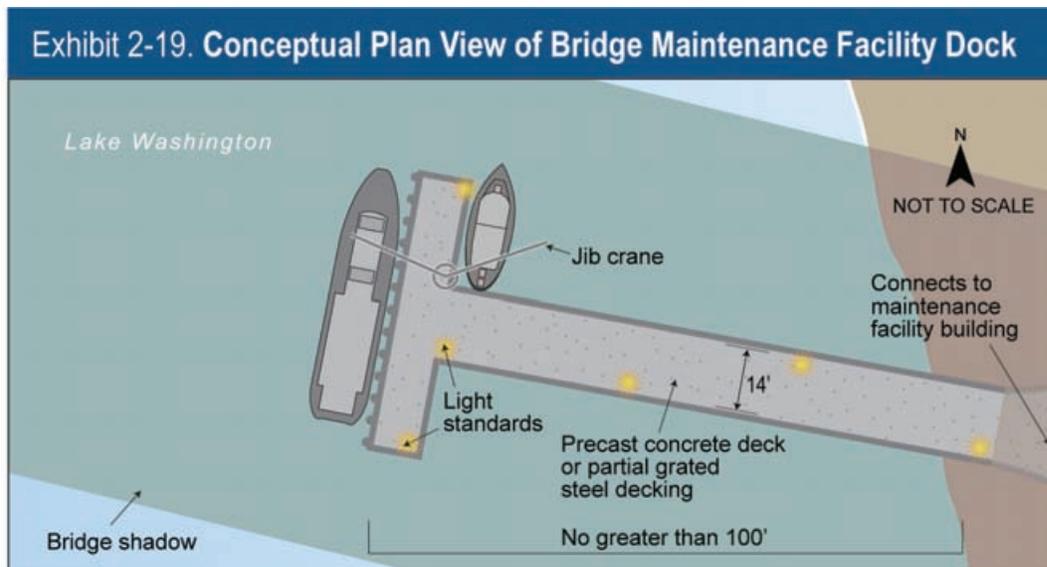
Conceptual Plan View of Bridge Maintenance Facility Dock
